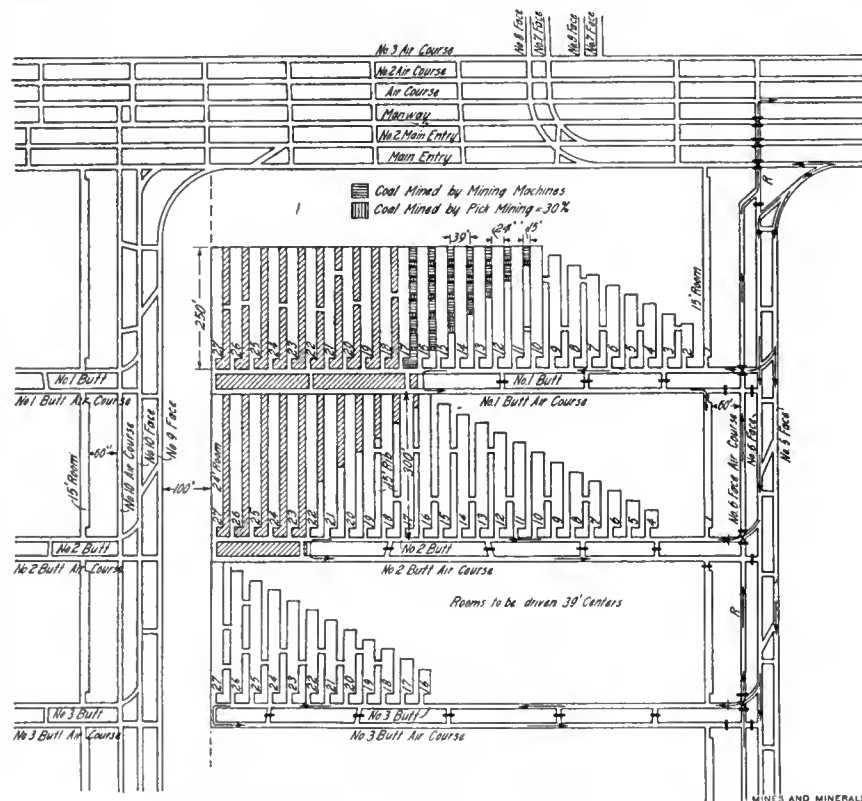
METHOD WHERE PILLARS ARE RECOVERED BY MINING MACHINES
